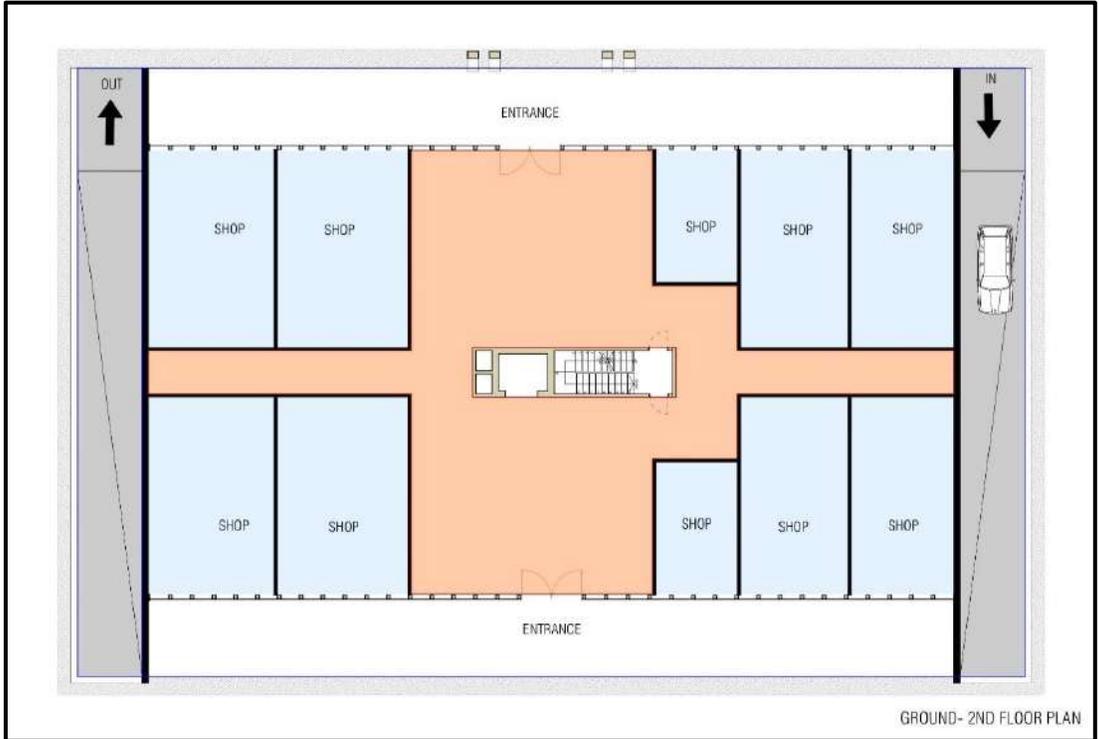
Conceptual Ground- Second Floor Layout (Commercial floors)
